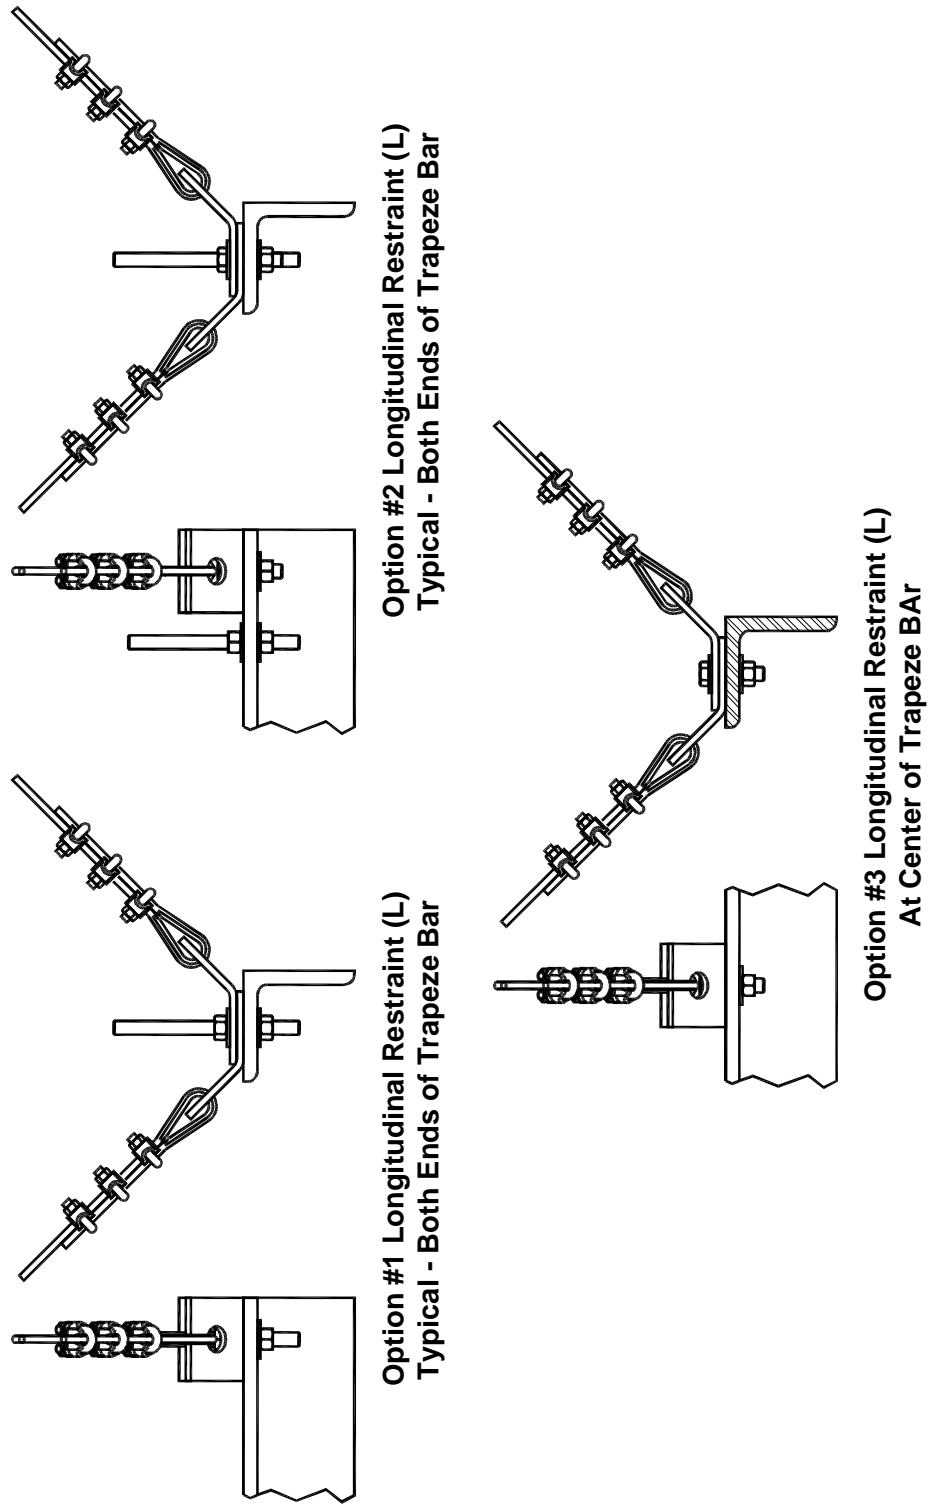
; KSCC Brackets Attached to a Rolled Structural Trapeze Bar – Longitudinal (L) Restraints
